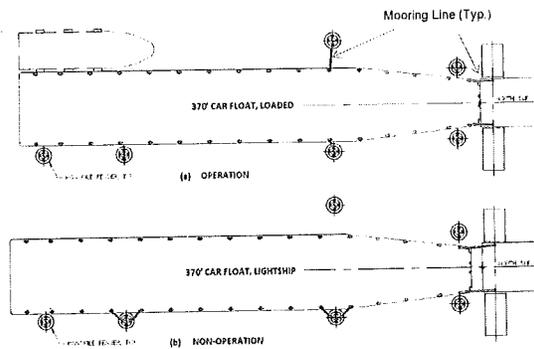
65th Street Facility W/ Proposed Mooring Arrangement Shown
